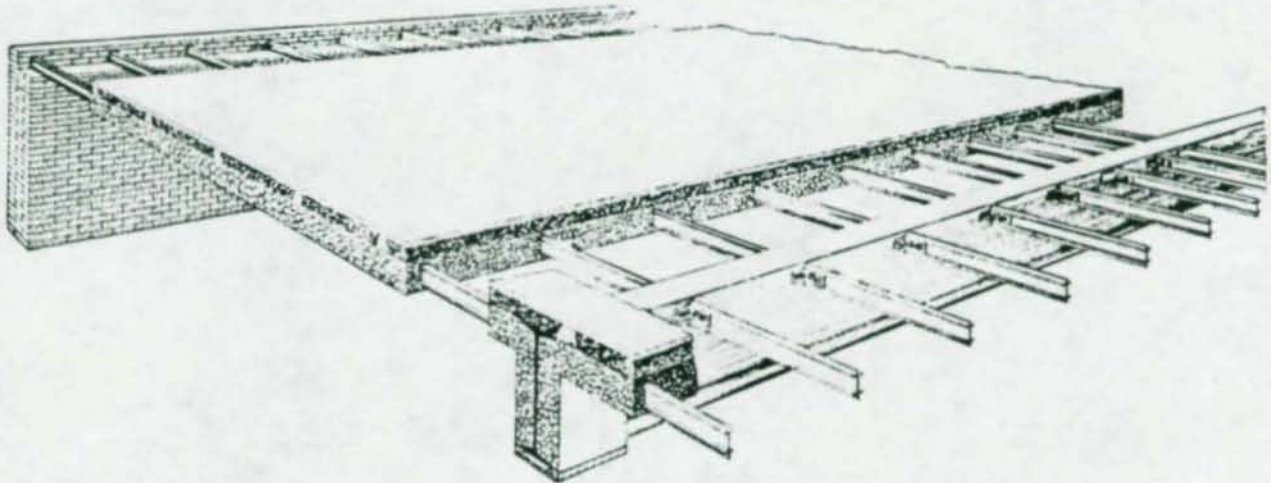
VIEW OF FLOOR WITH HEAVY BARS FRAMED TO GIRDERS
